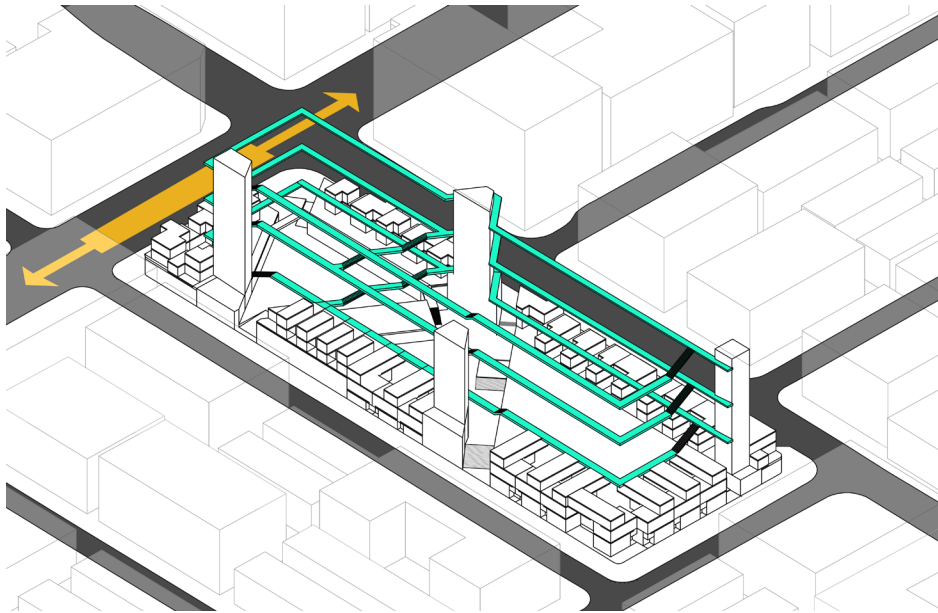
The elevated walkway winds up the interior of the courtyard, connecting the units and vertical cores together.
